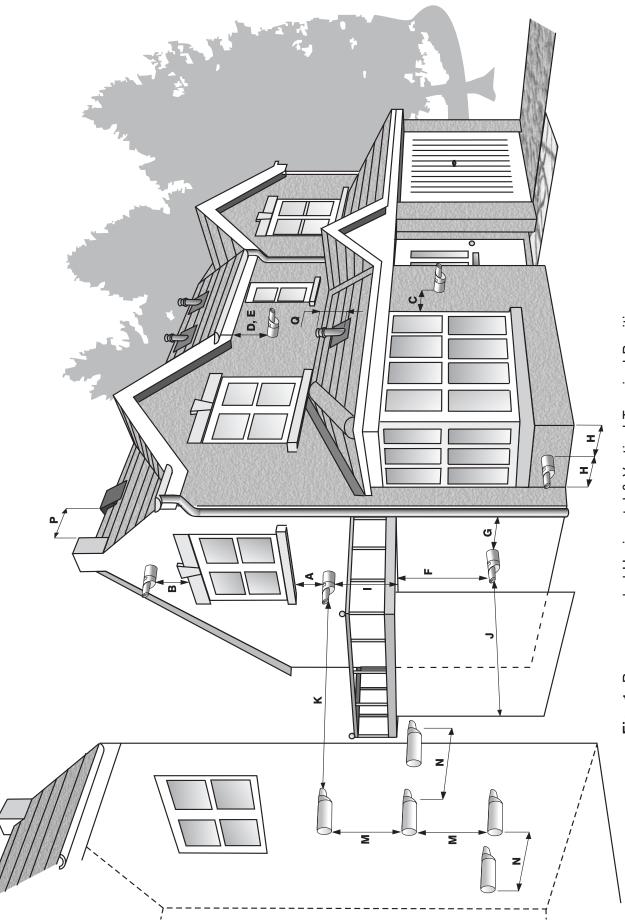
Recommended Horizontal & Vertical Terminal Positions
